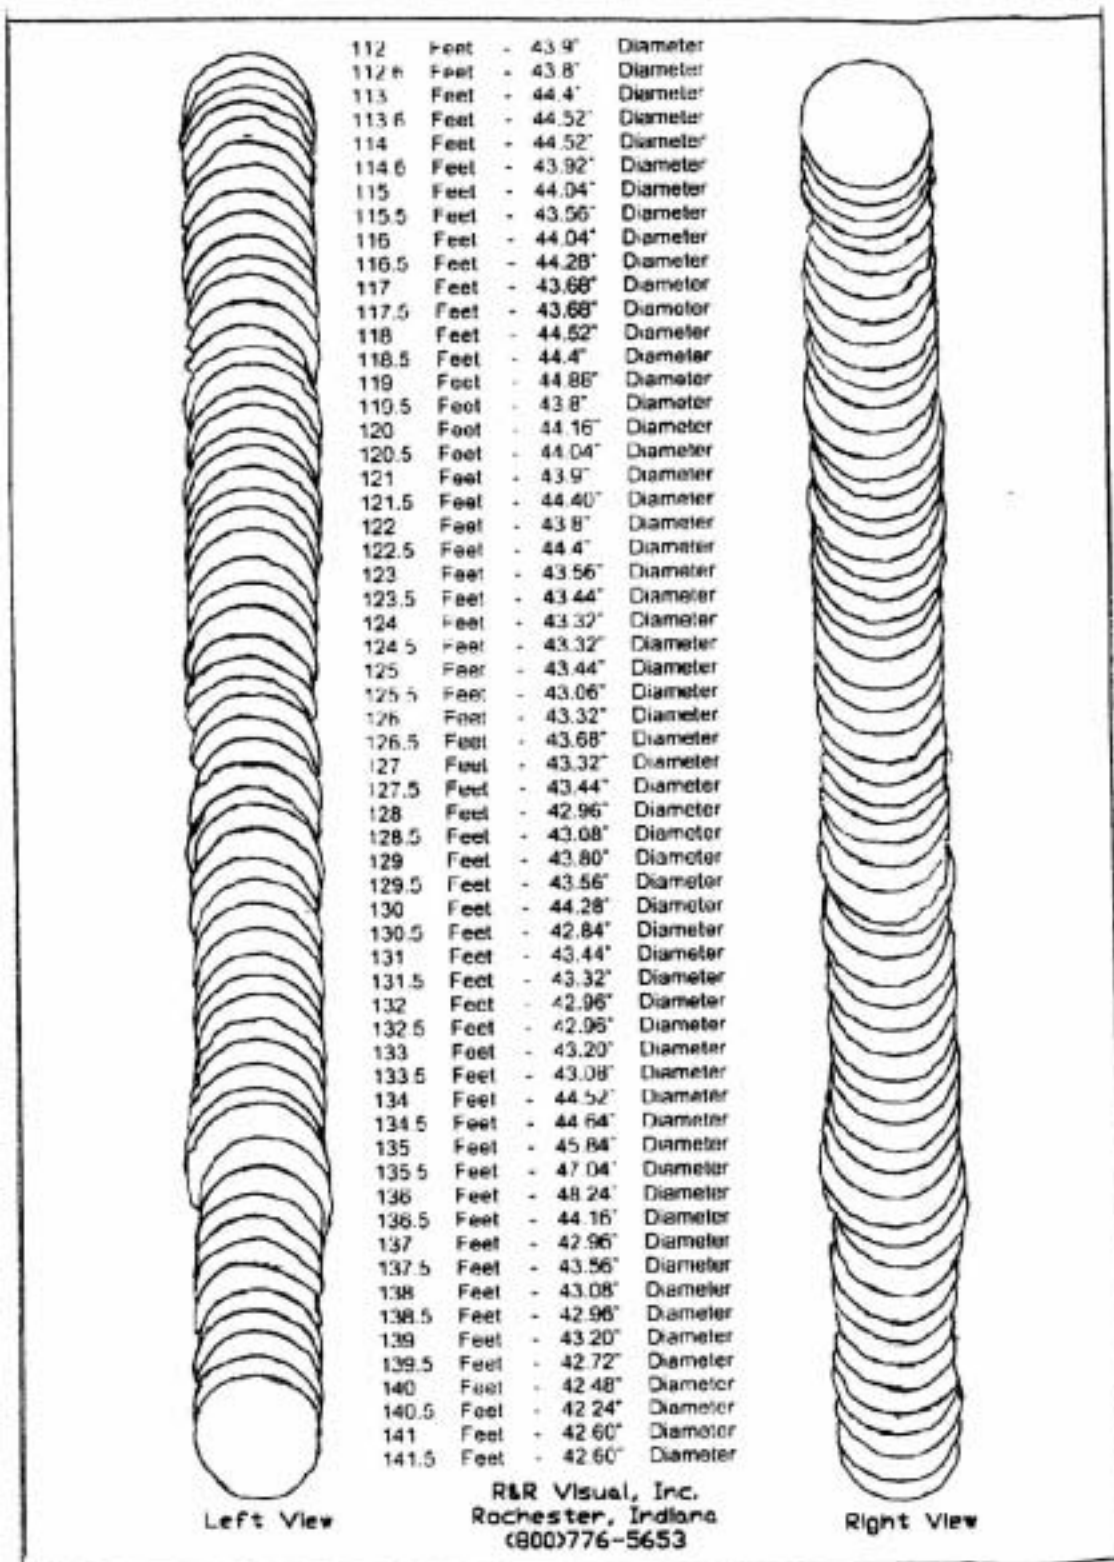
Sonar caliper log of rock socket for test shaft TS-1A.
